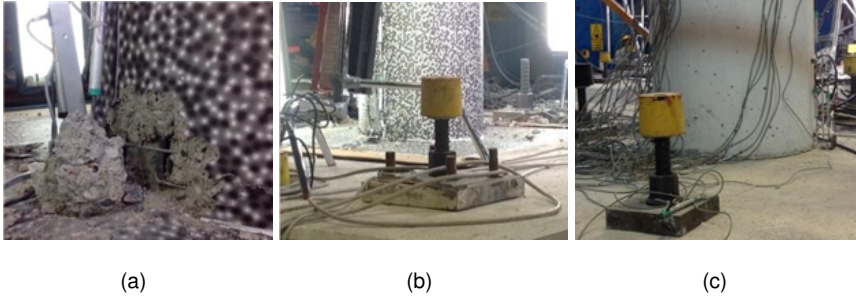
Cracks opening and buckling phenomena at the bottom section of columns after test k12: a) Pier #11; b) Pier #11; c) Pier #9.
